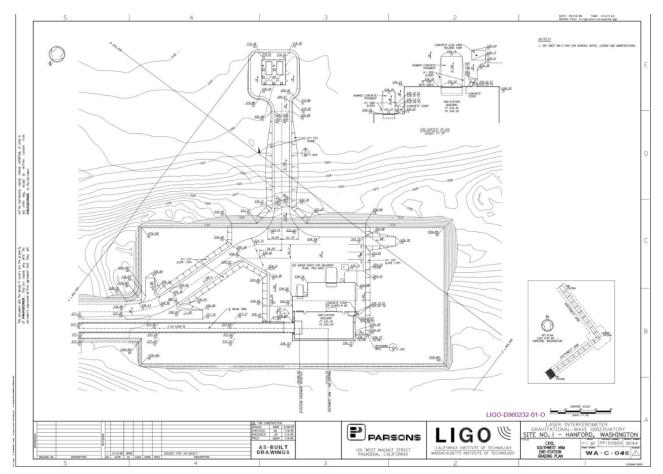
Civil, Southwest Arm, End-Station, Grading Plan D960232-01
